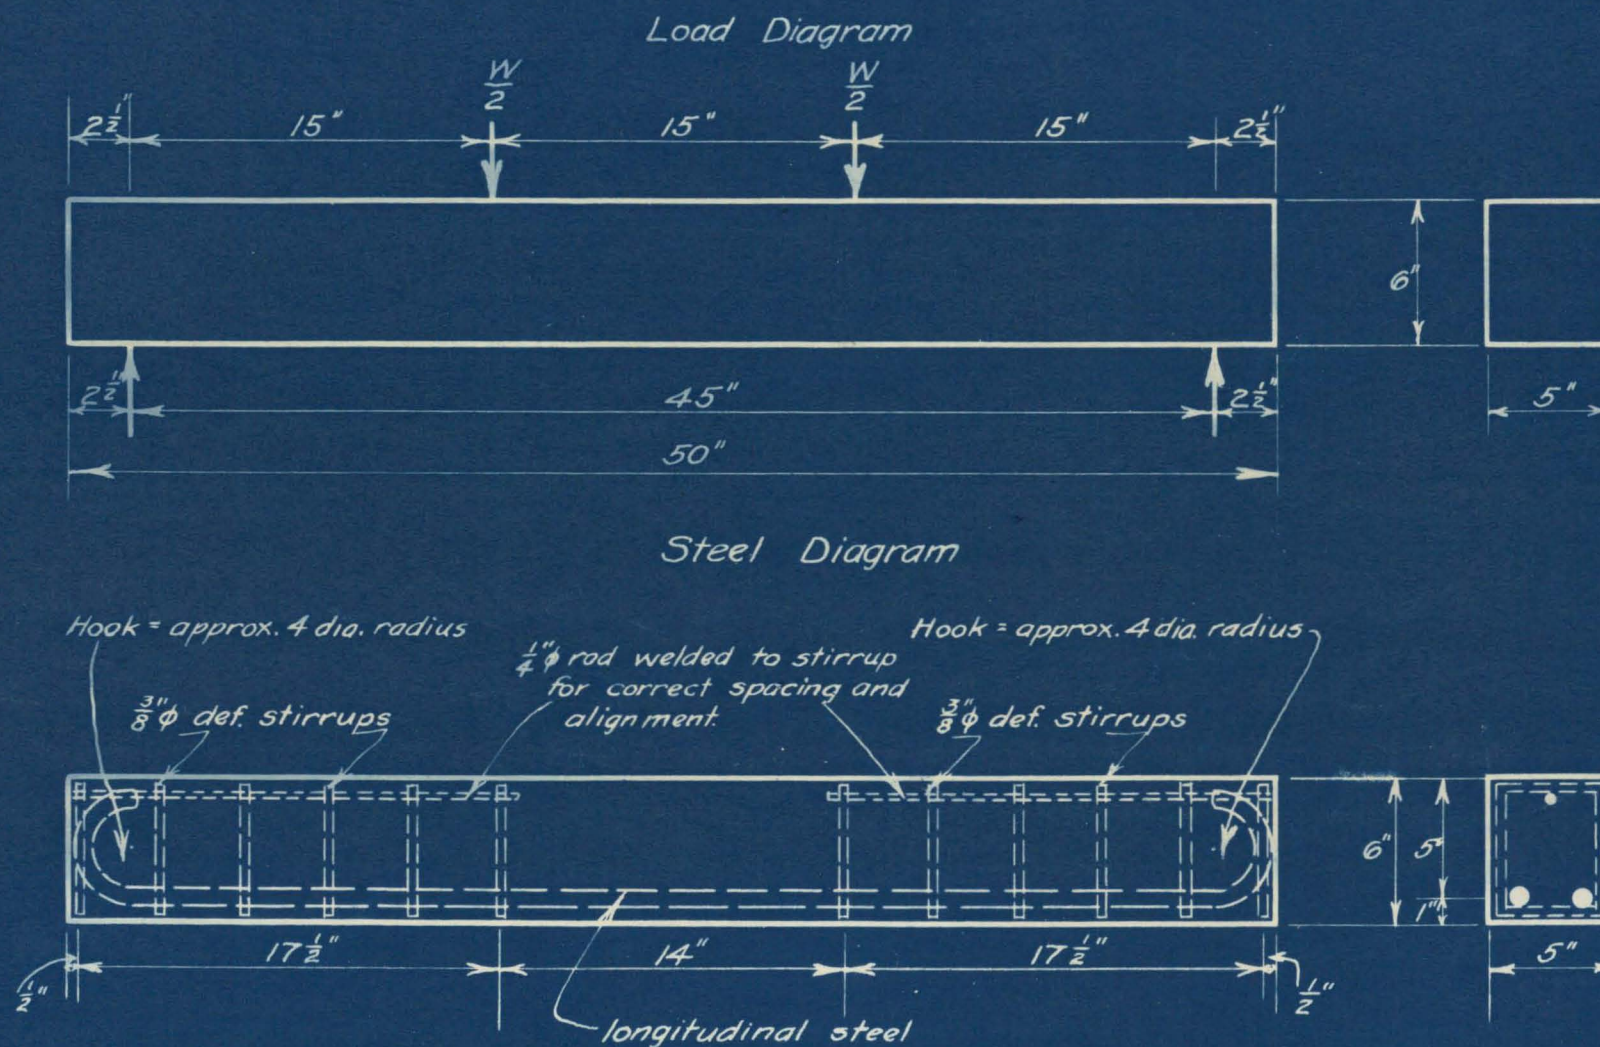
LOAD AND STEEL DIAGRAM FOR THE BEAMS
